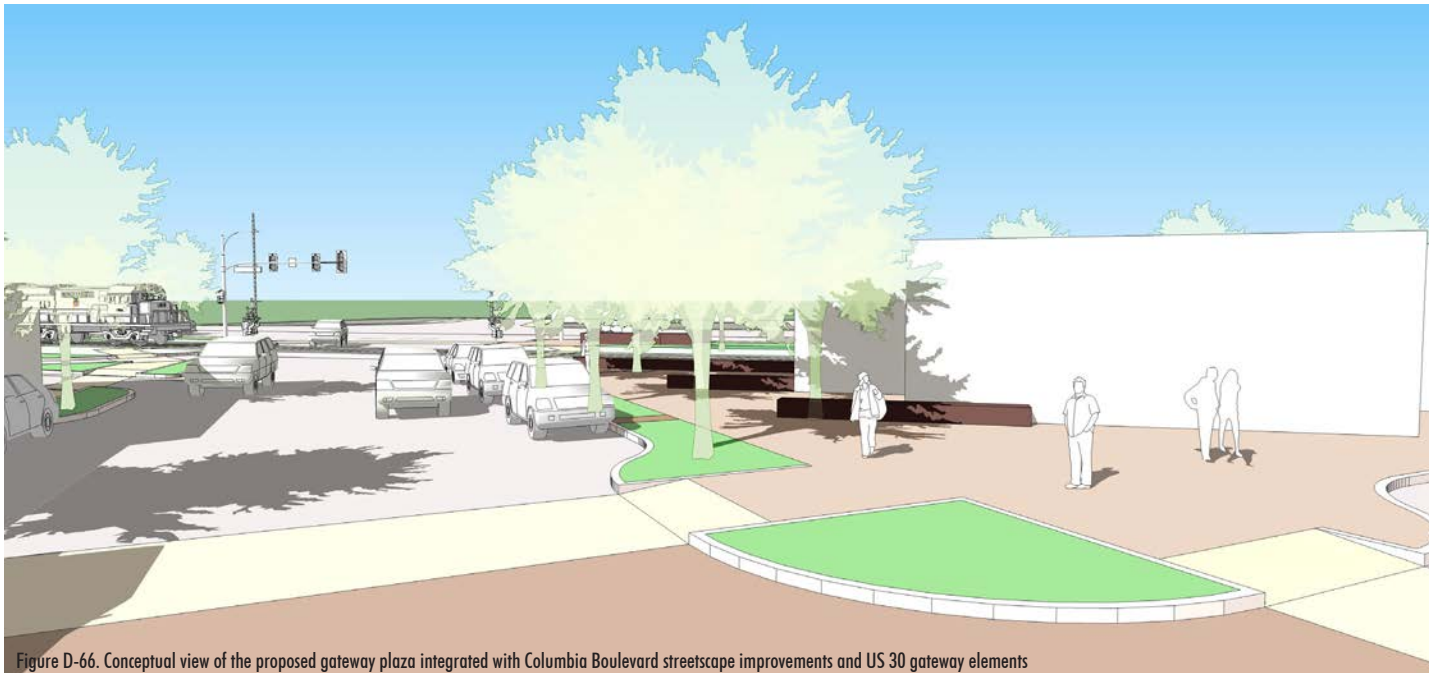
Conceptual view of the proposed gateway plaza integrated with Columbia Boulevard streetscape improvements and US 30 gateway elements
